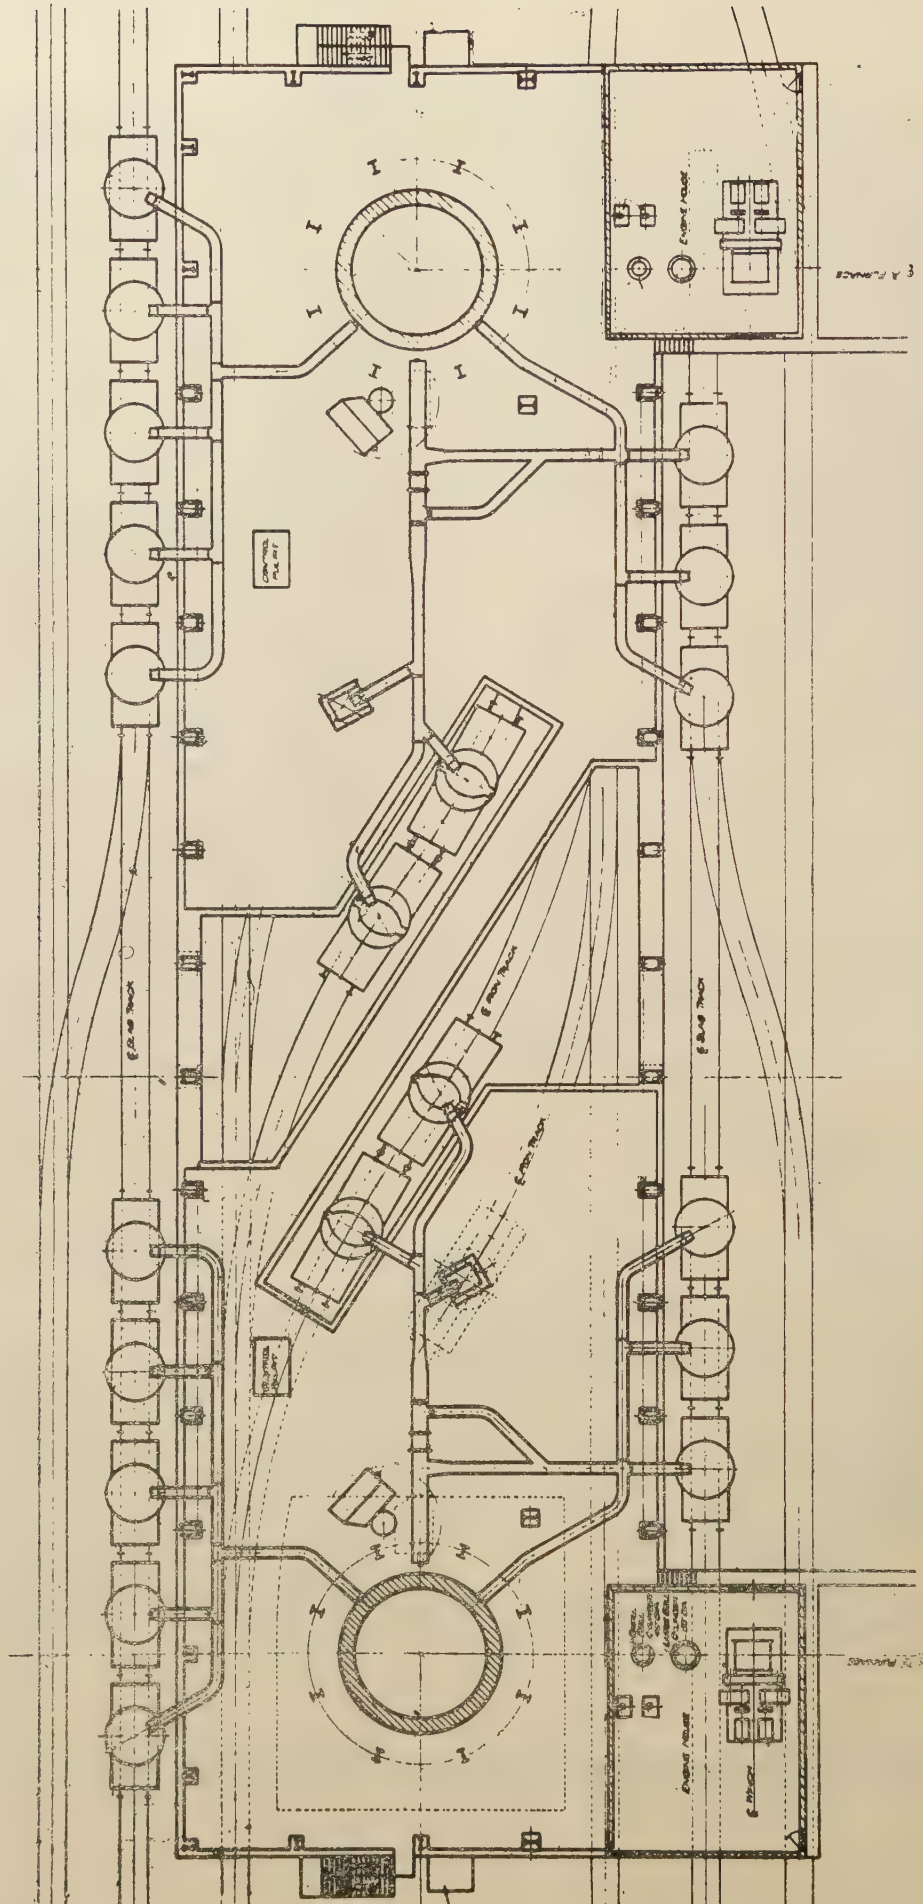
Layout of cast-house floor for furnaces making a large amount of slag
